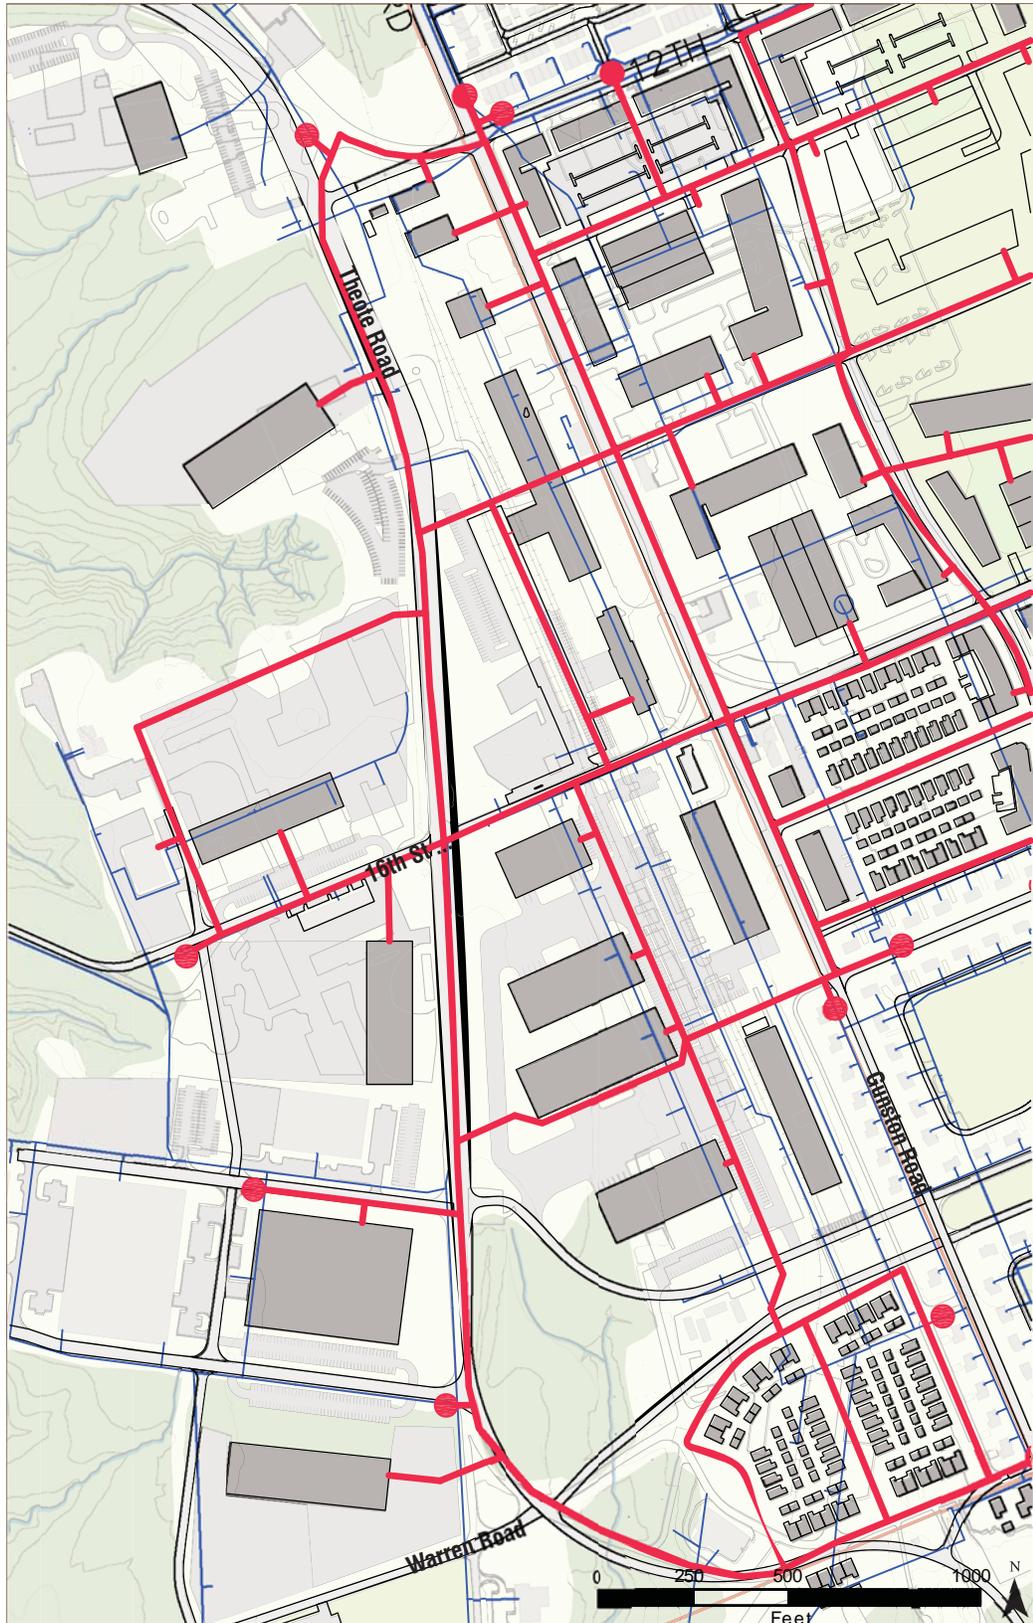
Full Buildout Storm Sewer System, Conceptual Layout
